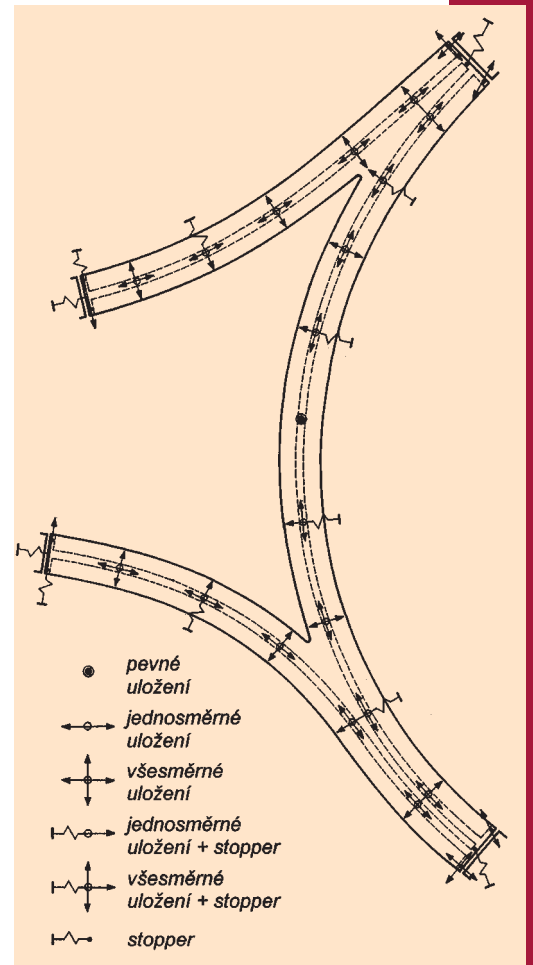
Bearings's arrangement of the curved structure with turning ramps – Bridge 223
